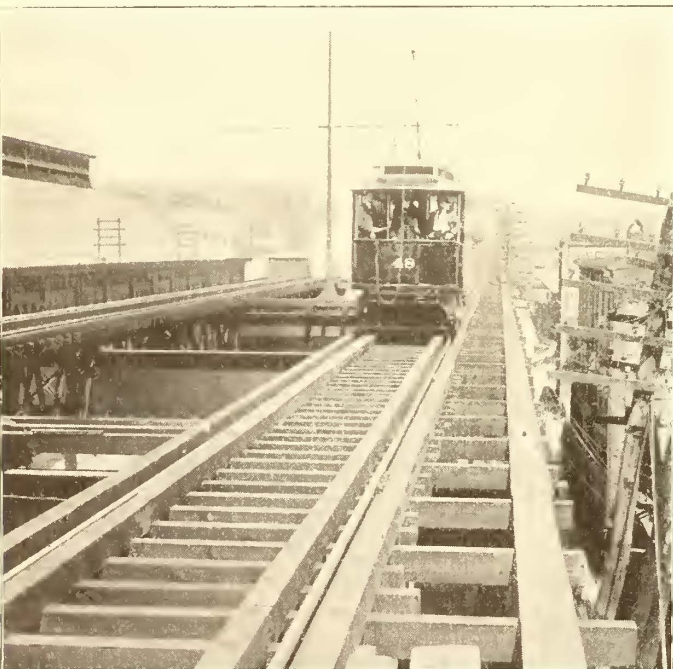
VIEW OF TRACK—LAKE ROLAND ELEVATED RAILWAY.
